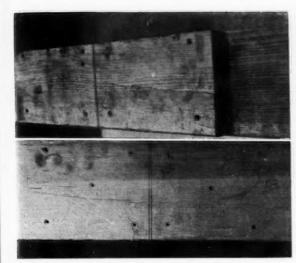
Failure in beam tests. Upper: Joint failure. Lower: Tension failure in gusset
